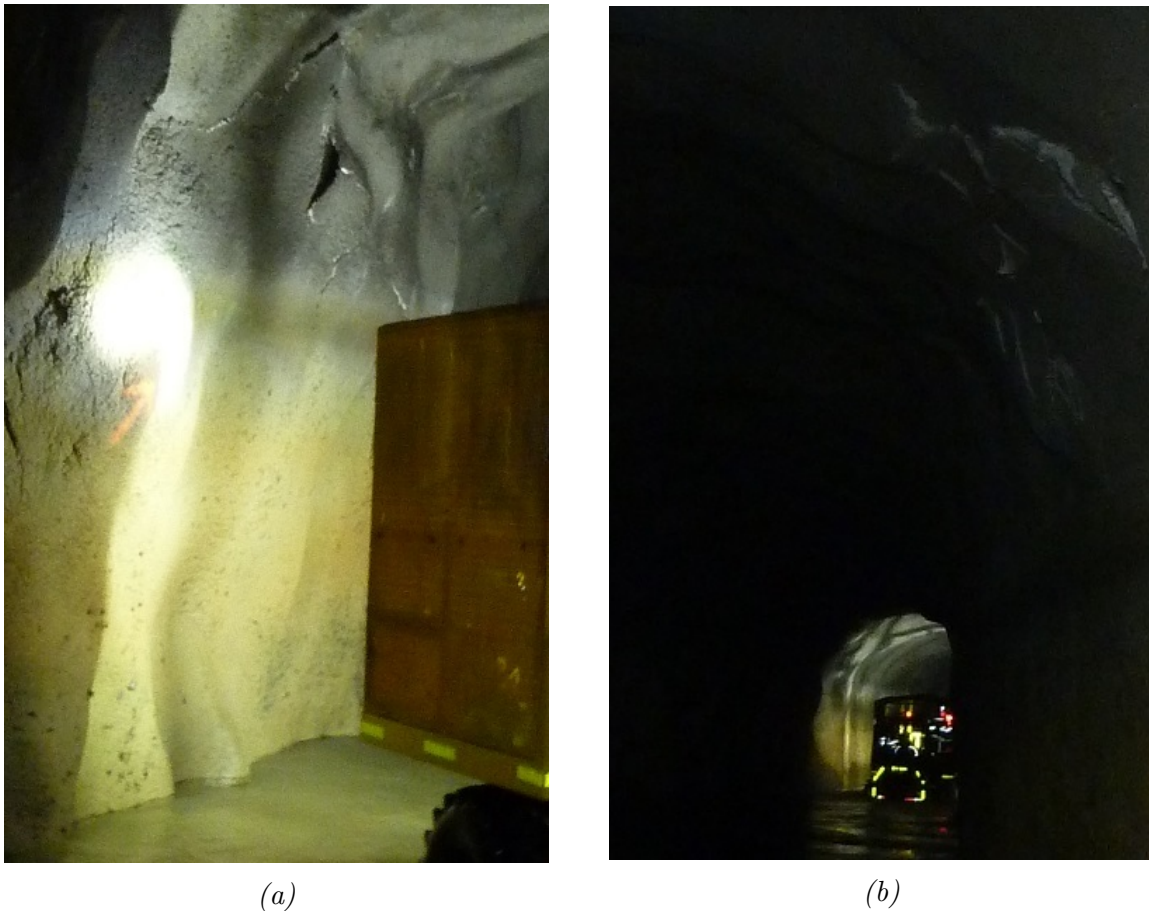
Shotcrete cracks in the Portillo tunnel, looking downstream. The cracks in (a) are likely due to poor adhesion. In (b) the cracks are possibly related to poor adhesion or stress concentration.
